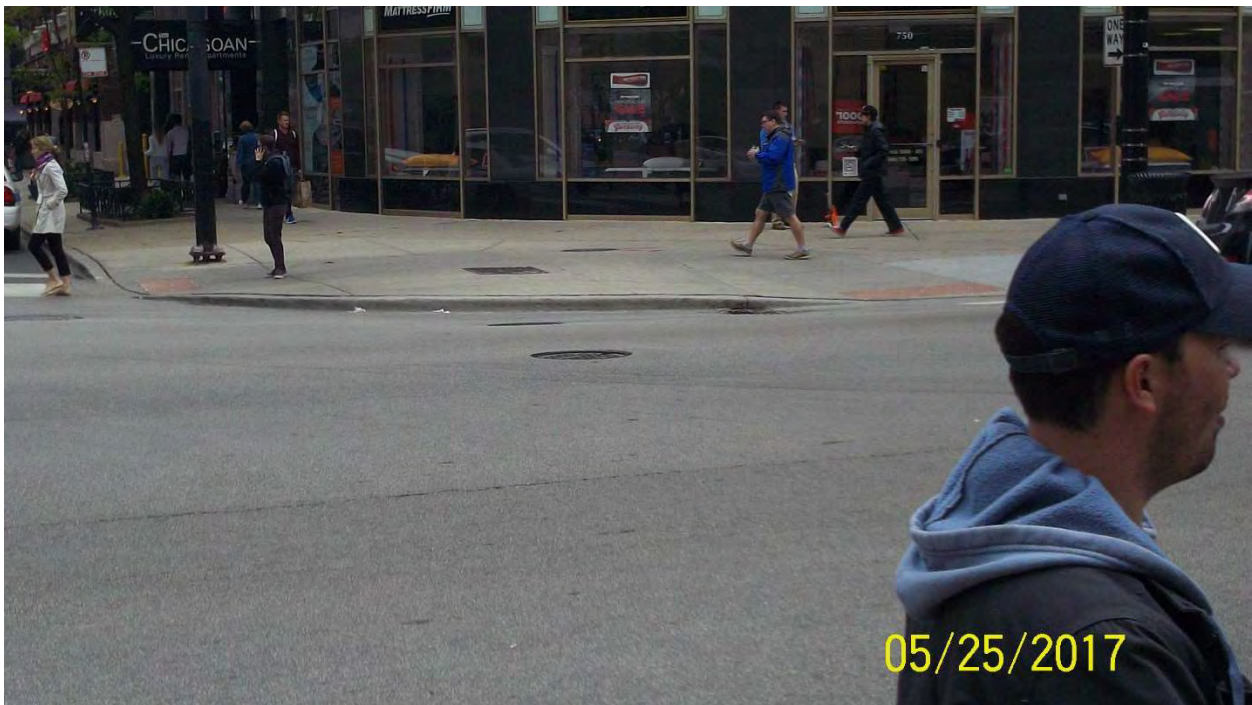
Northeast corner of Chicago Ave. / Rush St. – Looking Southwest
